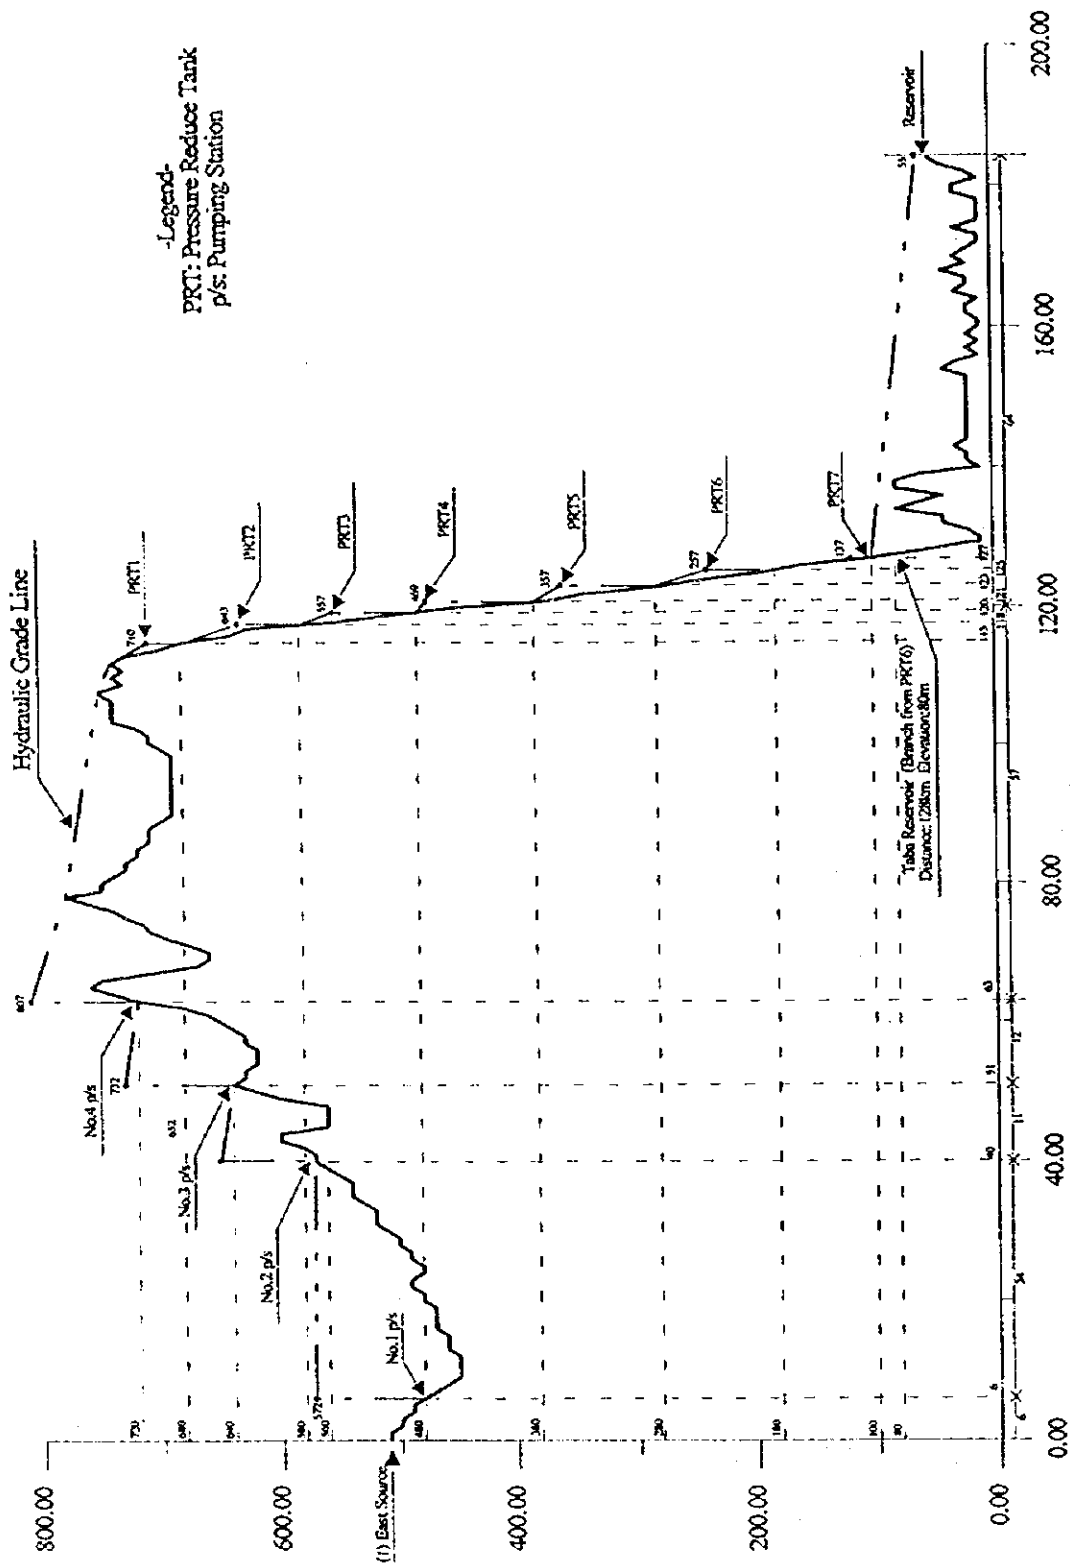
Longitudinal Profile of Conveyance Pipeline (Plan 2)
